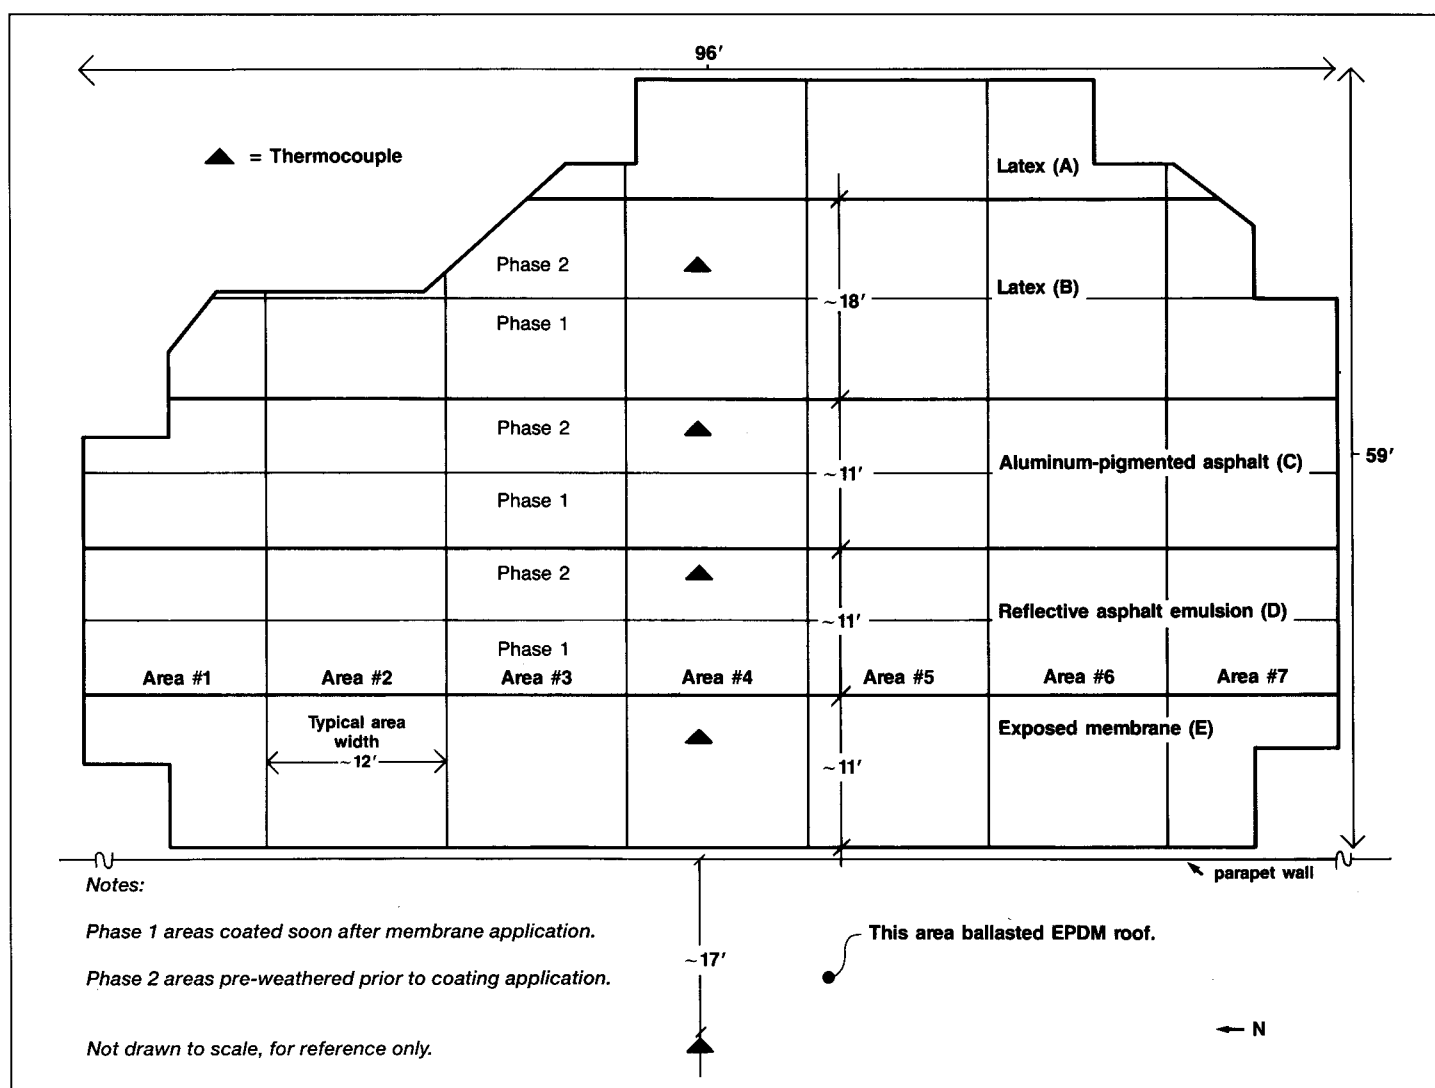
Plan view of the APP Weathering Farm showing exposed and coated membrane layout, and thermocouple locations.
